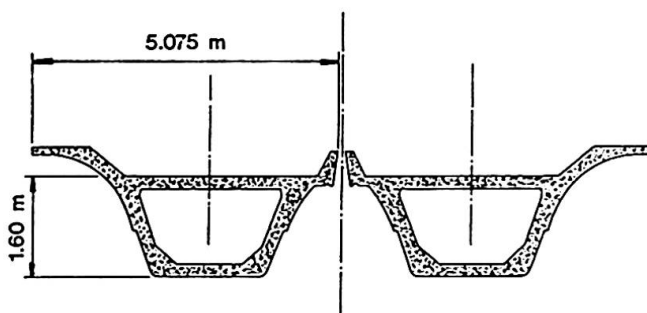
TYPICAL VIADUCT CROSS-SECTION FOR SINGAPORE MRT SYSTEM
